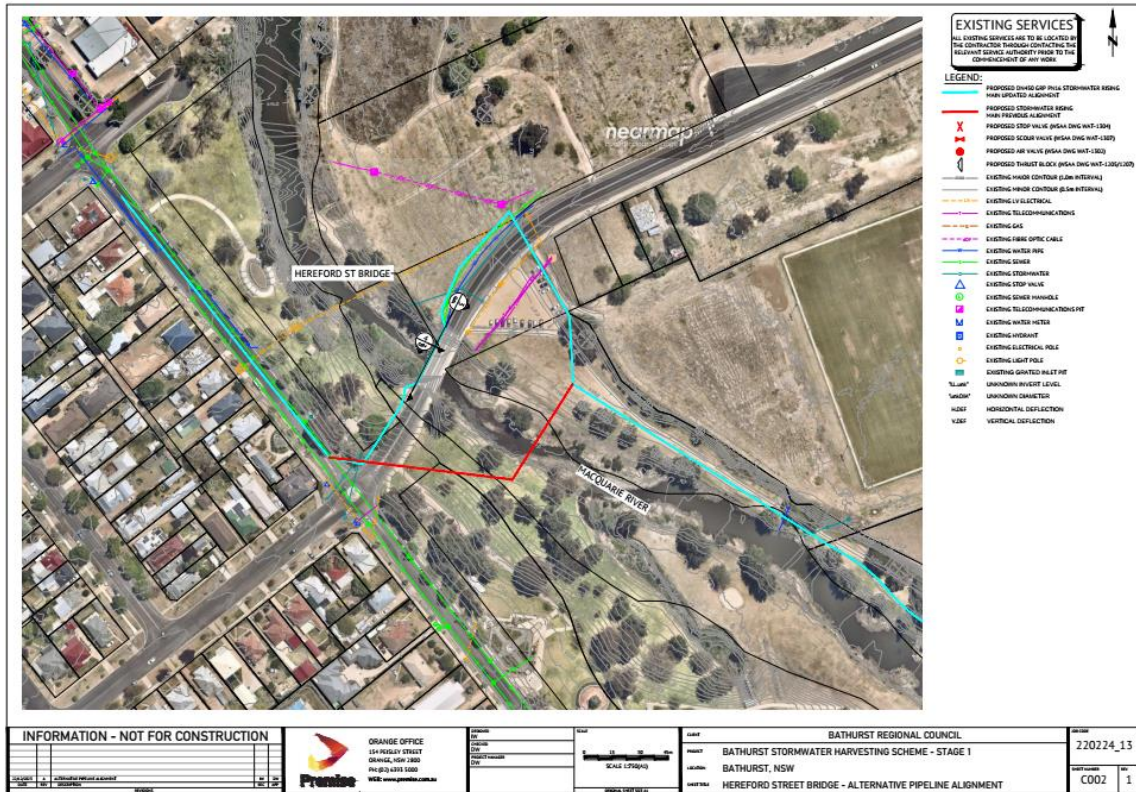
Drawing C002, Bathurst Stormwater Harvesting Scheme – Stage 1, Hereford Street Bridge – Alternative Pipeline Arrangement. Source: Premise.
